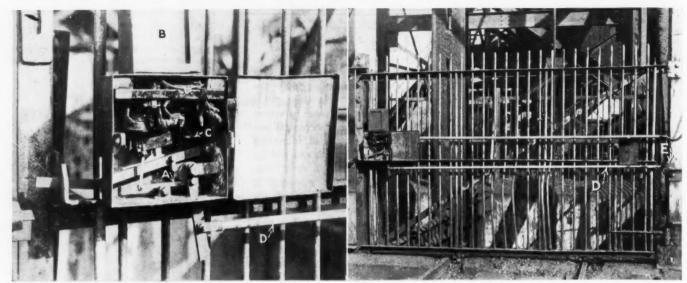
Close-Up of Latch Box in Position on Shaft Gate.
